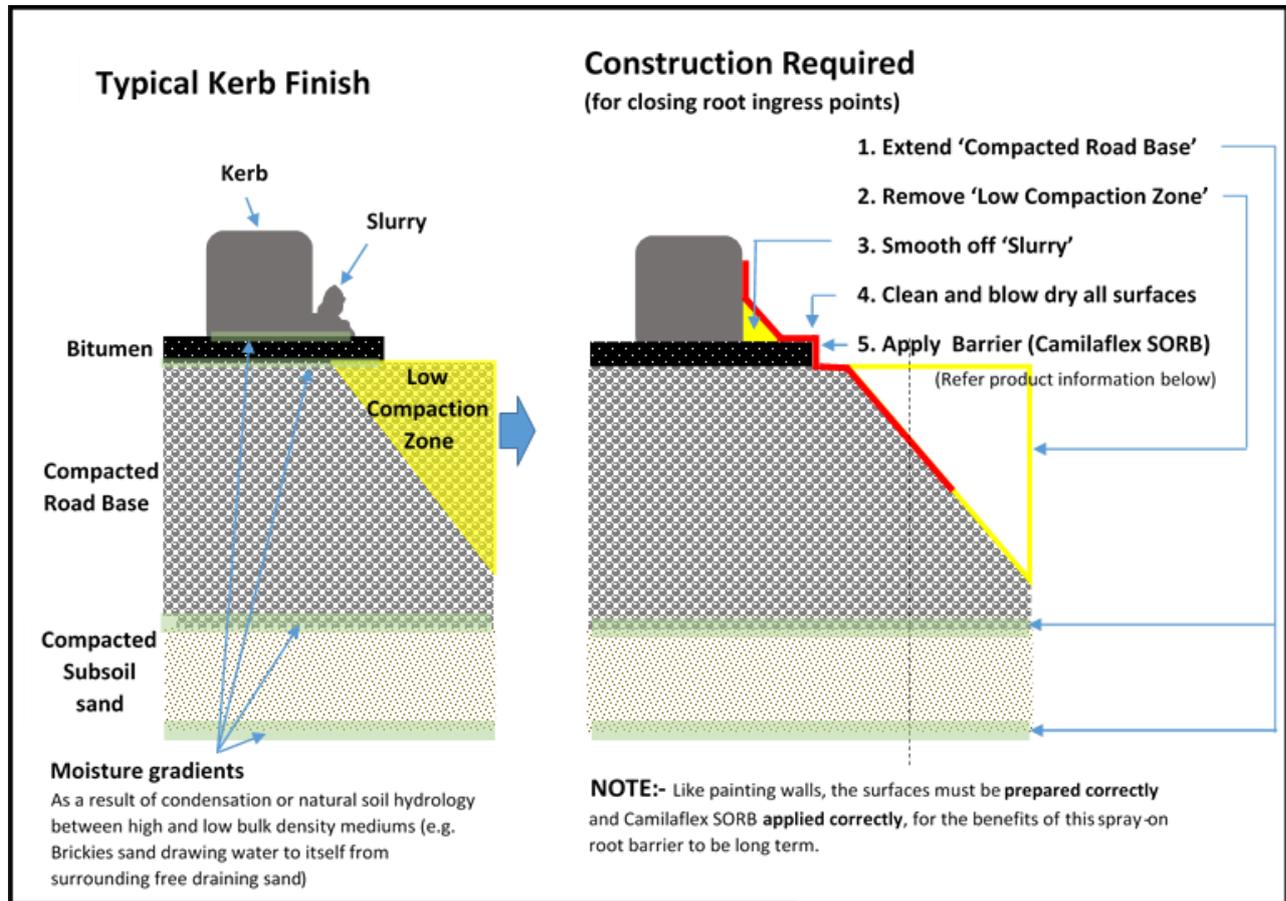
Typical Kerb Construction Required for Root Ingress Protection in Perth sands
